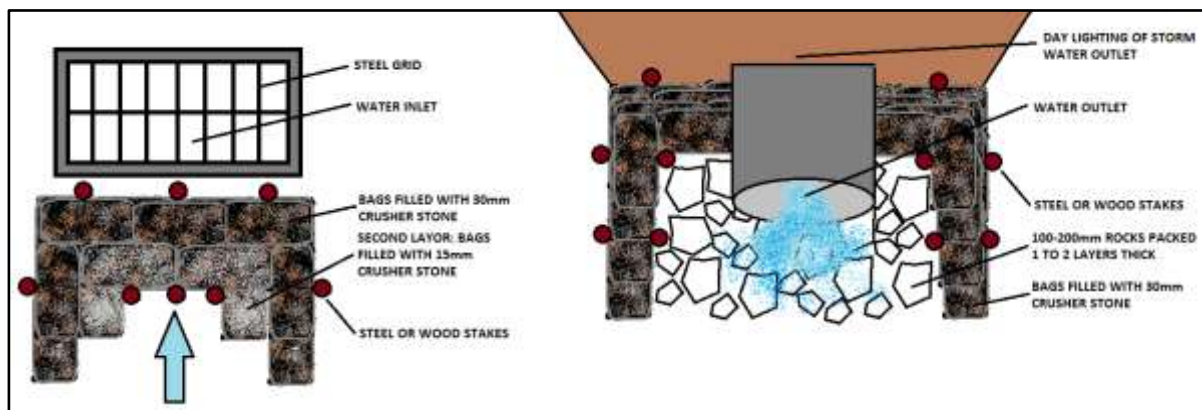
Temporary culvert inlet and outlet (Solek, 2014)
